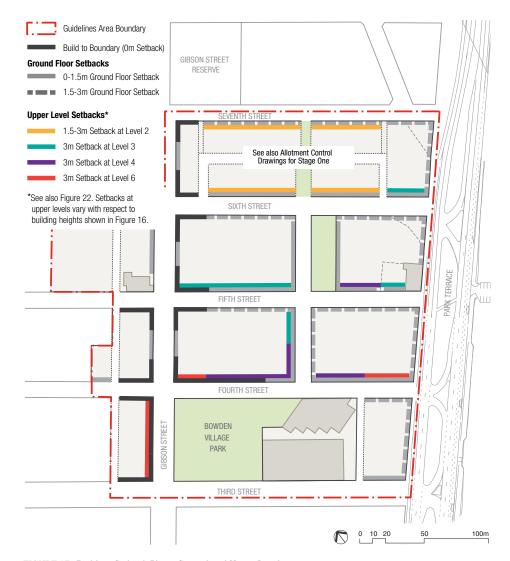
Building Setback Plan - Ground and Upper Levels
